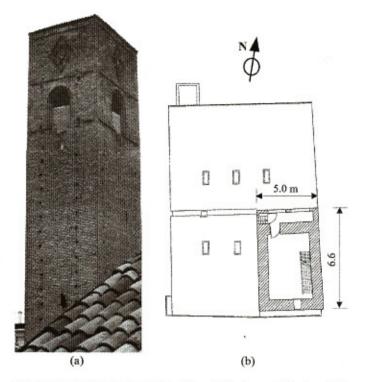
Torre Astesiano: (a) elevation of the tower; (b) plan of the tower and the building it is embedded in
